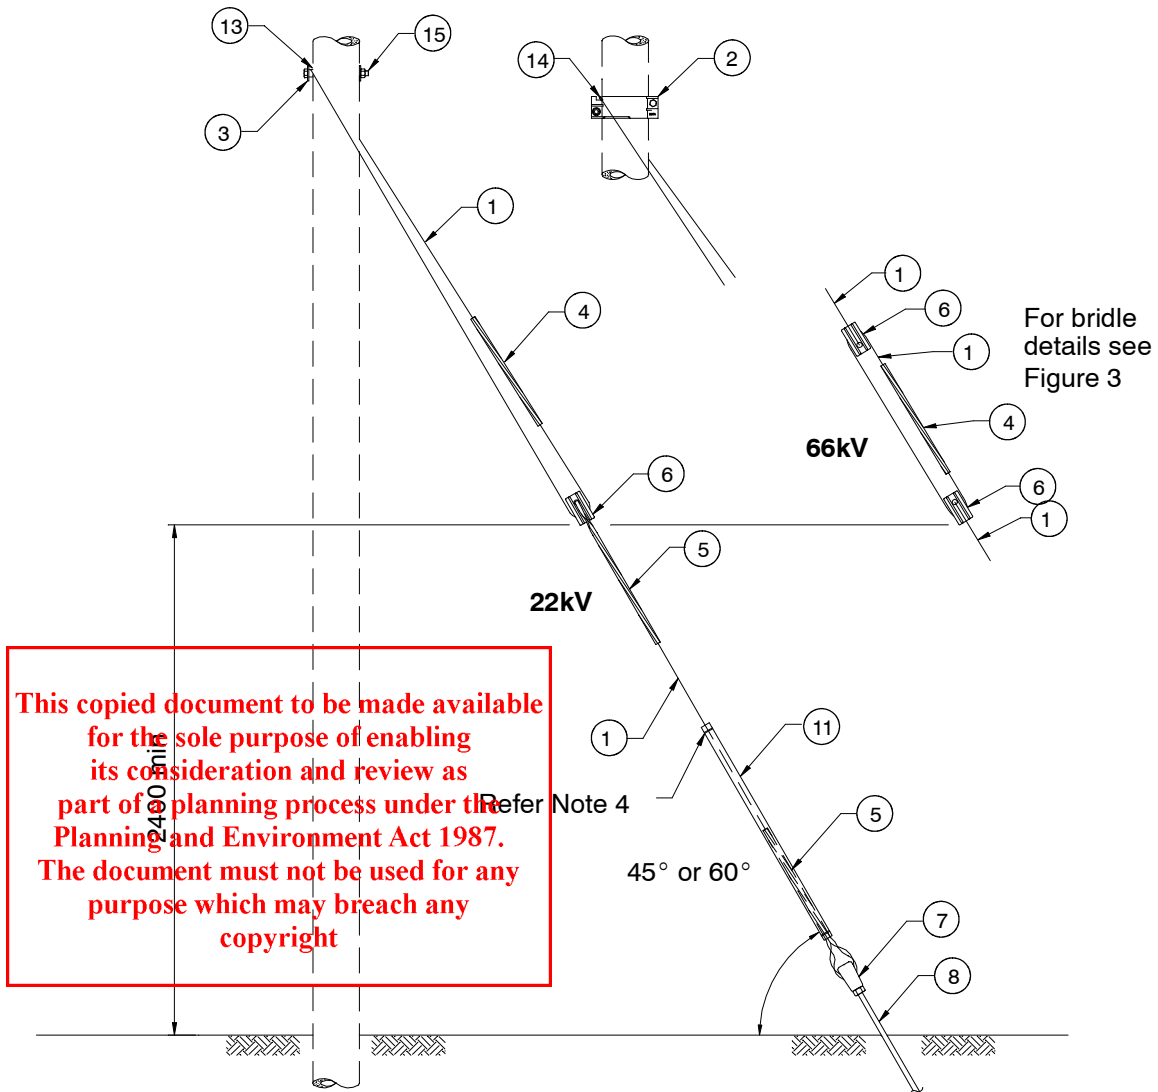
No.5 Ground Stay Assembly - Concrete Pole
